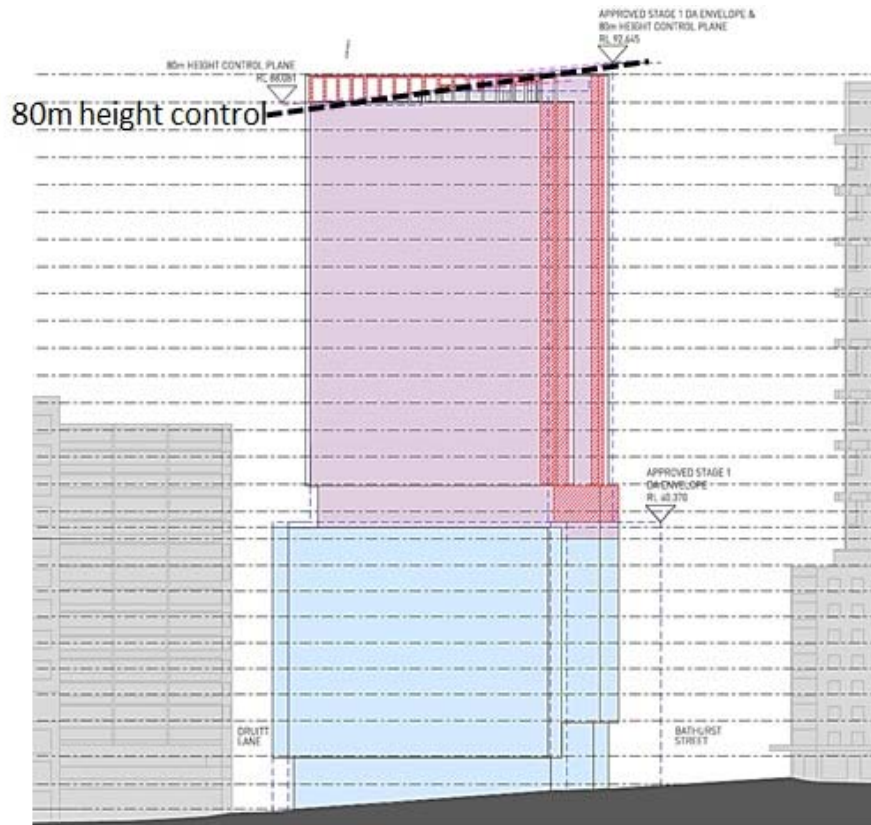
Western (Sussex Street) elevation of proposed modifications to approved Stage 1 envelope.
